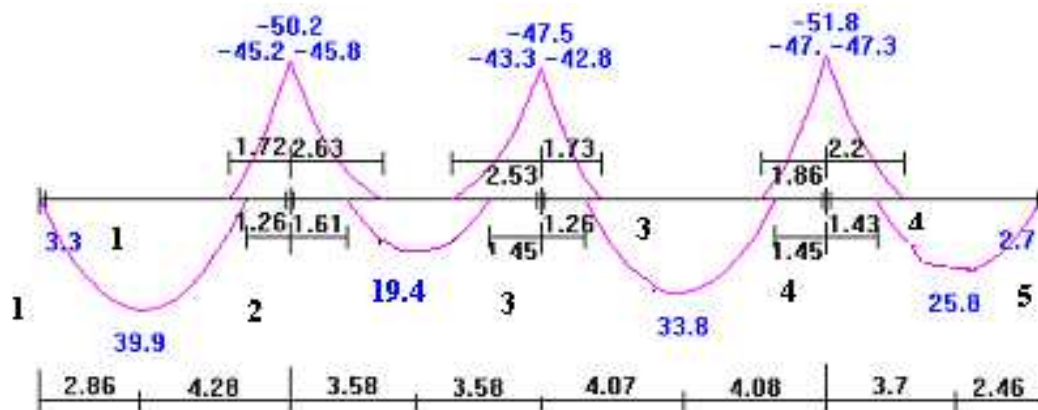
Moment Envelope for Beam 2 (ton.m)
